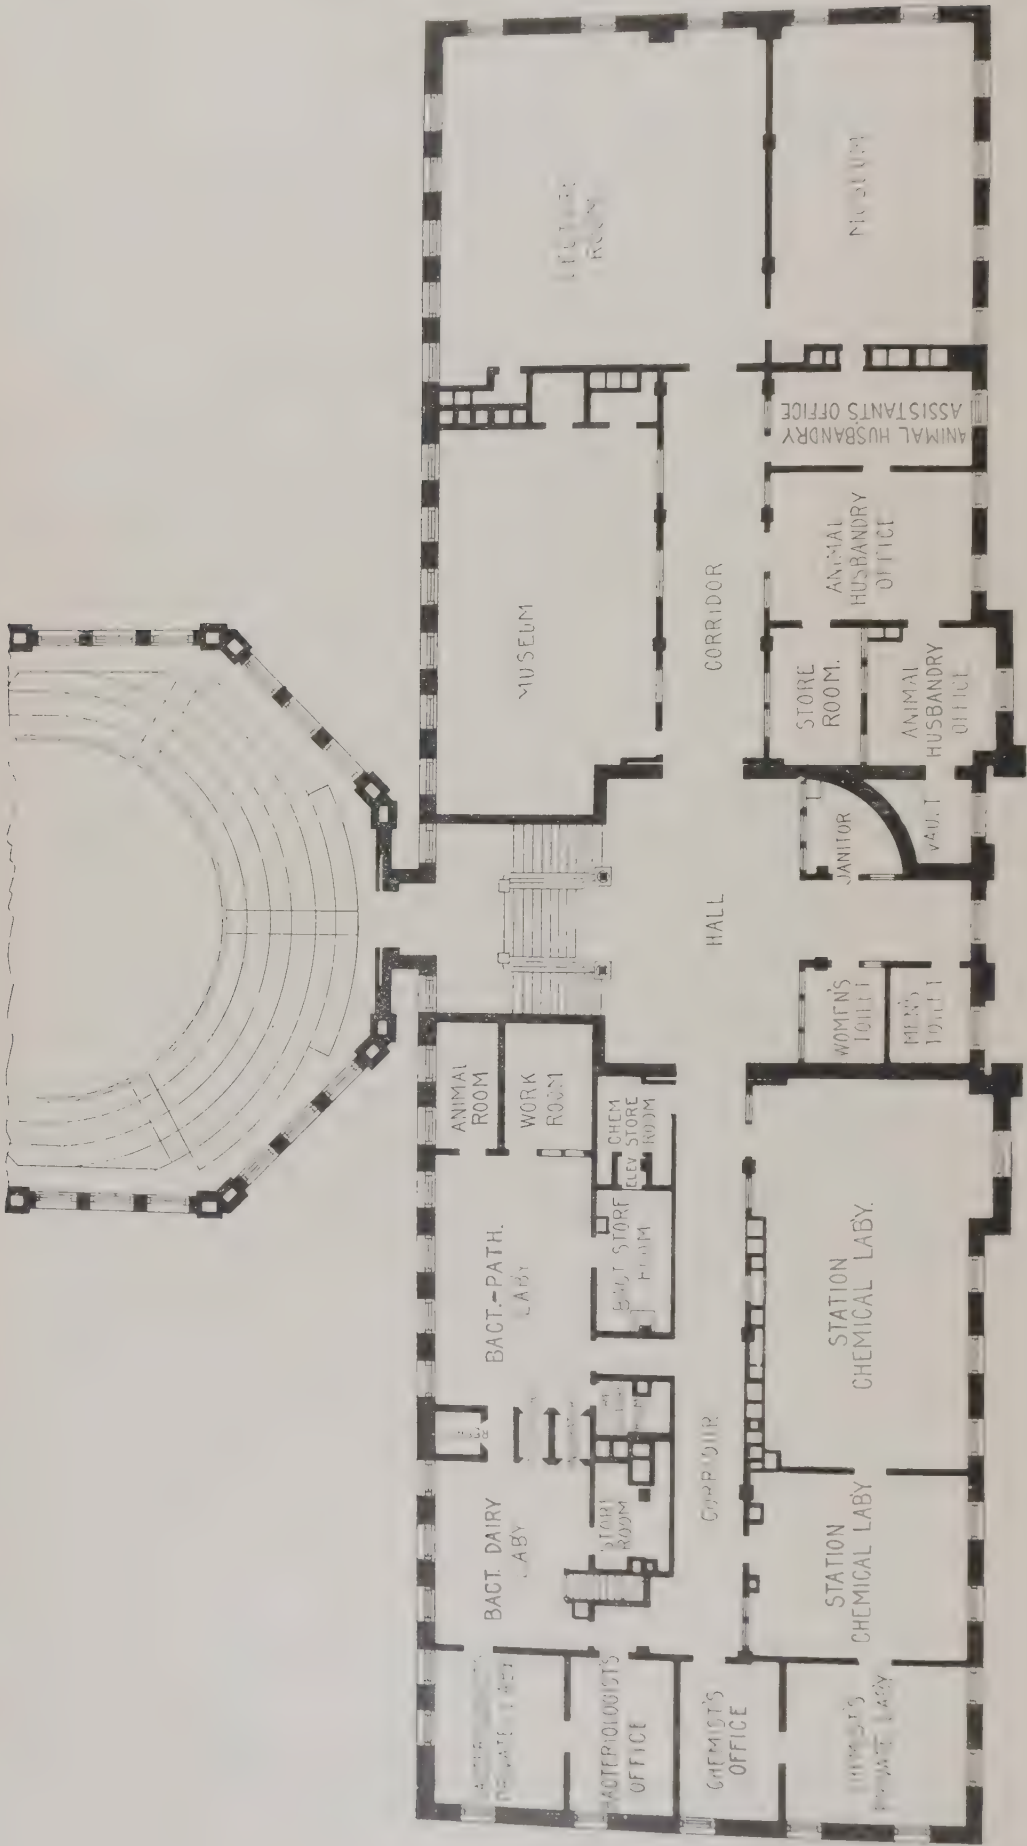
First-floor plan, Agricultural Building, Wisconsin University.
